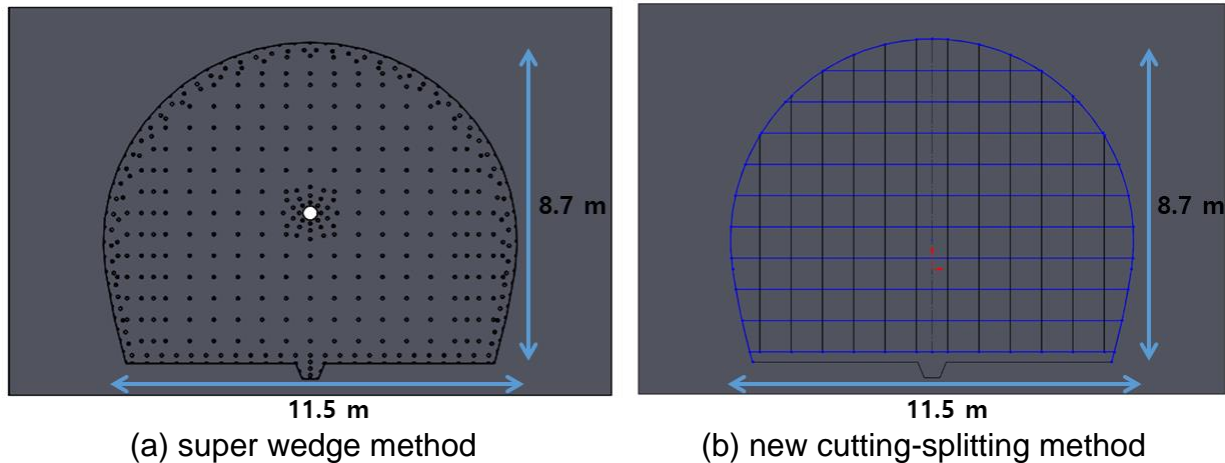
Works of previous drilling and new cutting methods for tunnel excavation.
